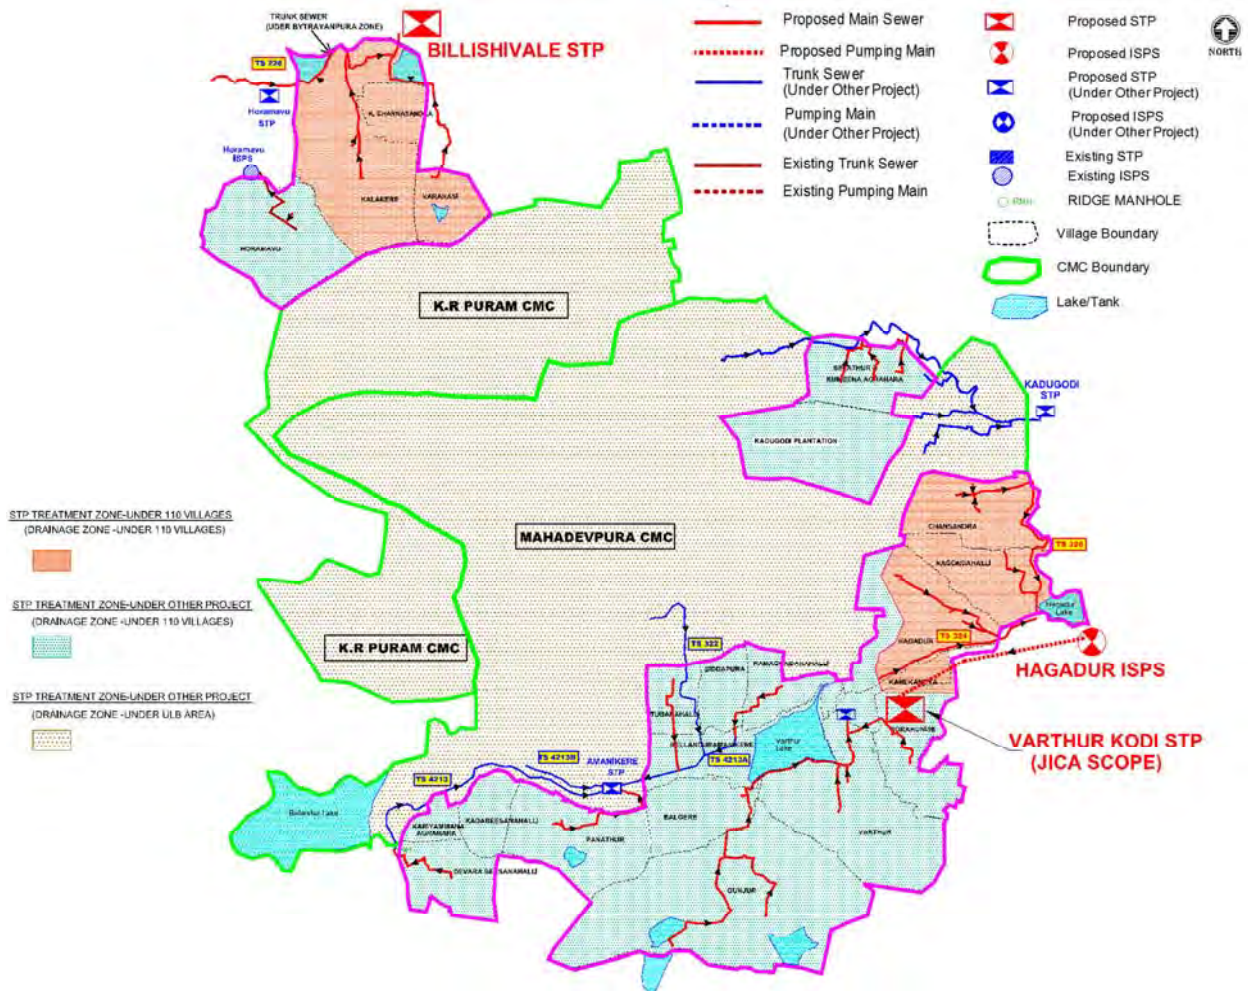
Layout Plan of Main Sewer Lines in Bytrayanapura Zone
